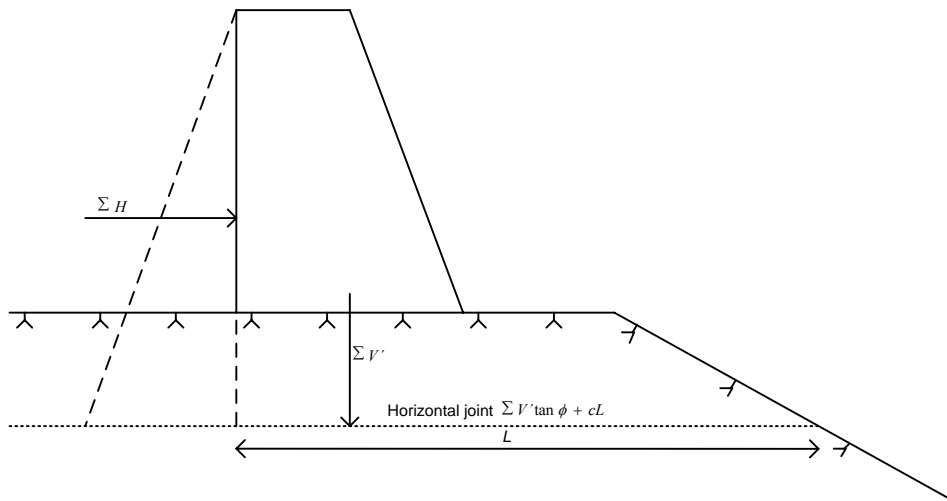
Plane sliding along a horizontal joint which day-light downstream the dam (After Underwood and Dixon 1976).
